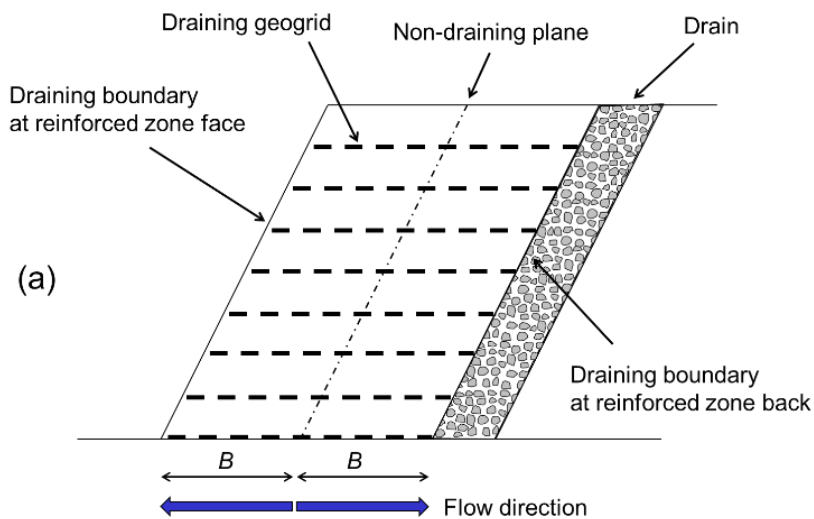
Schematic of the reinforcement and drainage system consisting of draining geogrid and draining boundary to the rear of the reinforced soil block.
